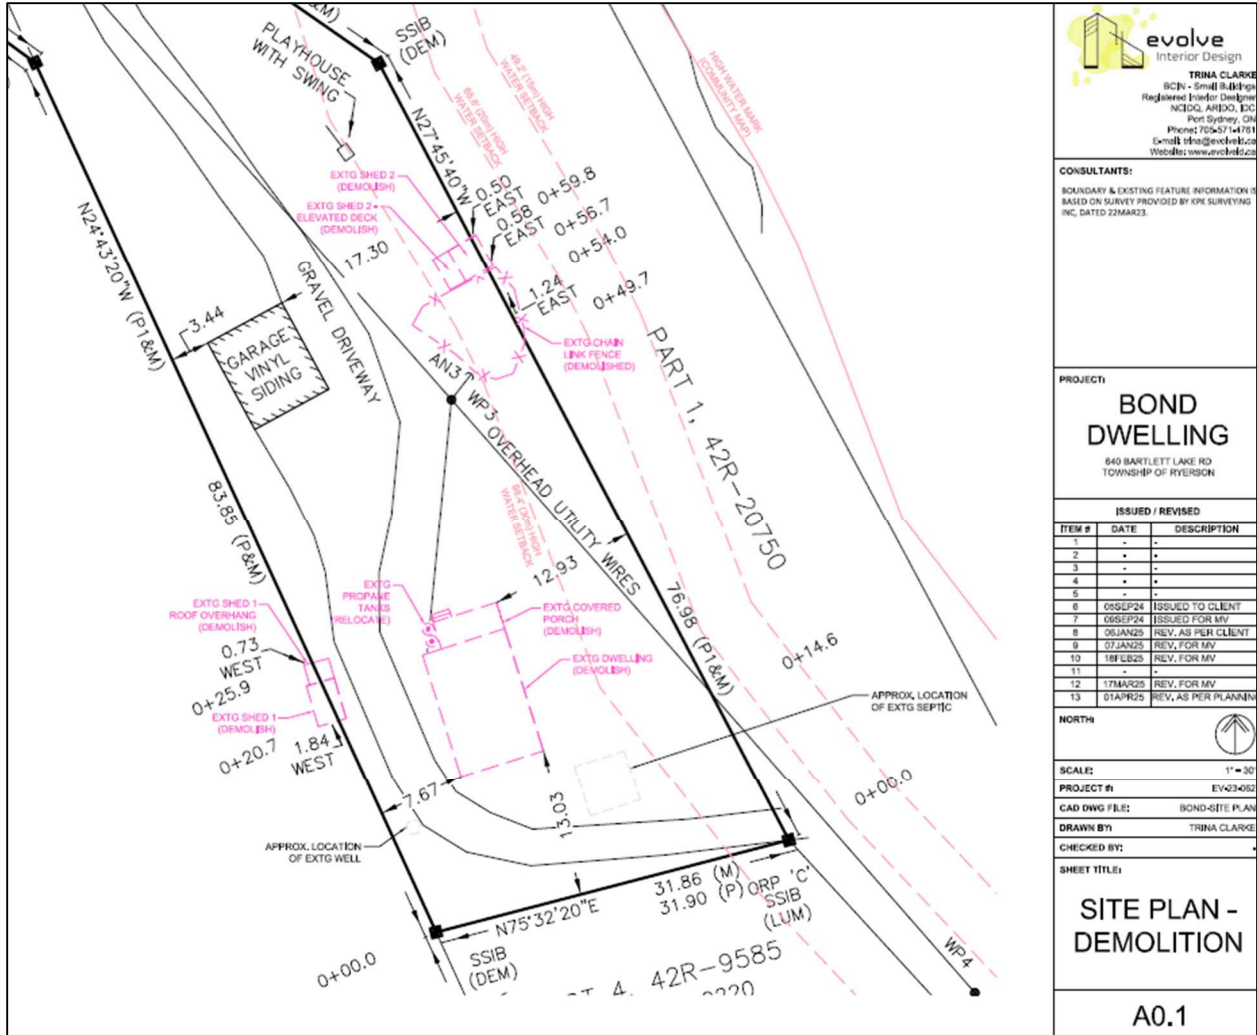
Demolition Plan (applicant supplied sketch with mark-ups)
